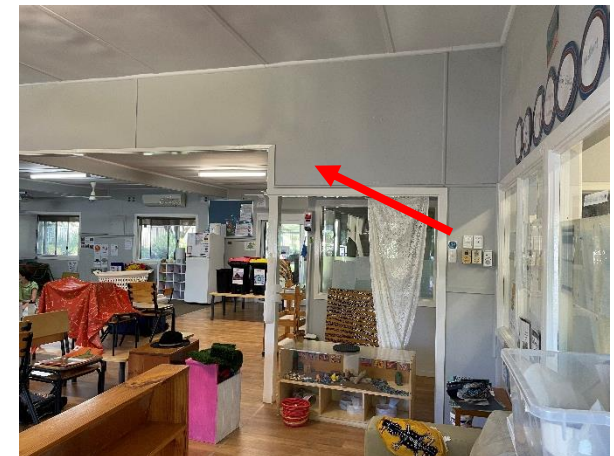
Main Building – lead based grey paint to the internal walls throughout the Emerald Room
